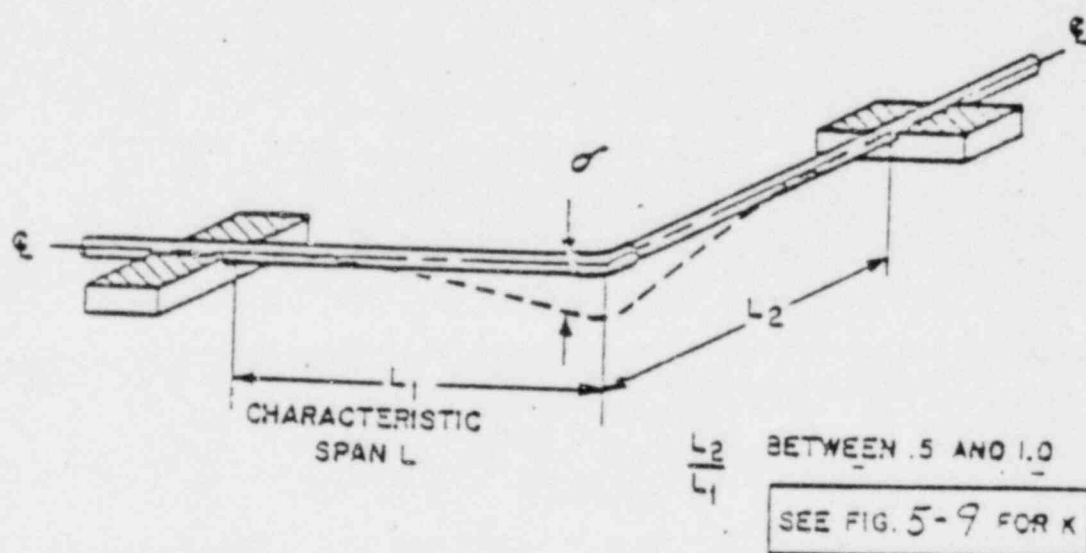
SPAN-ELBOW-SPAN OUT OF PLANE
